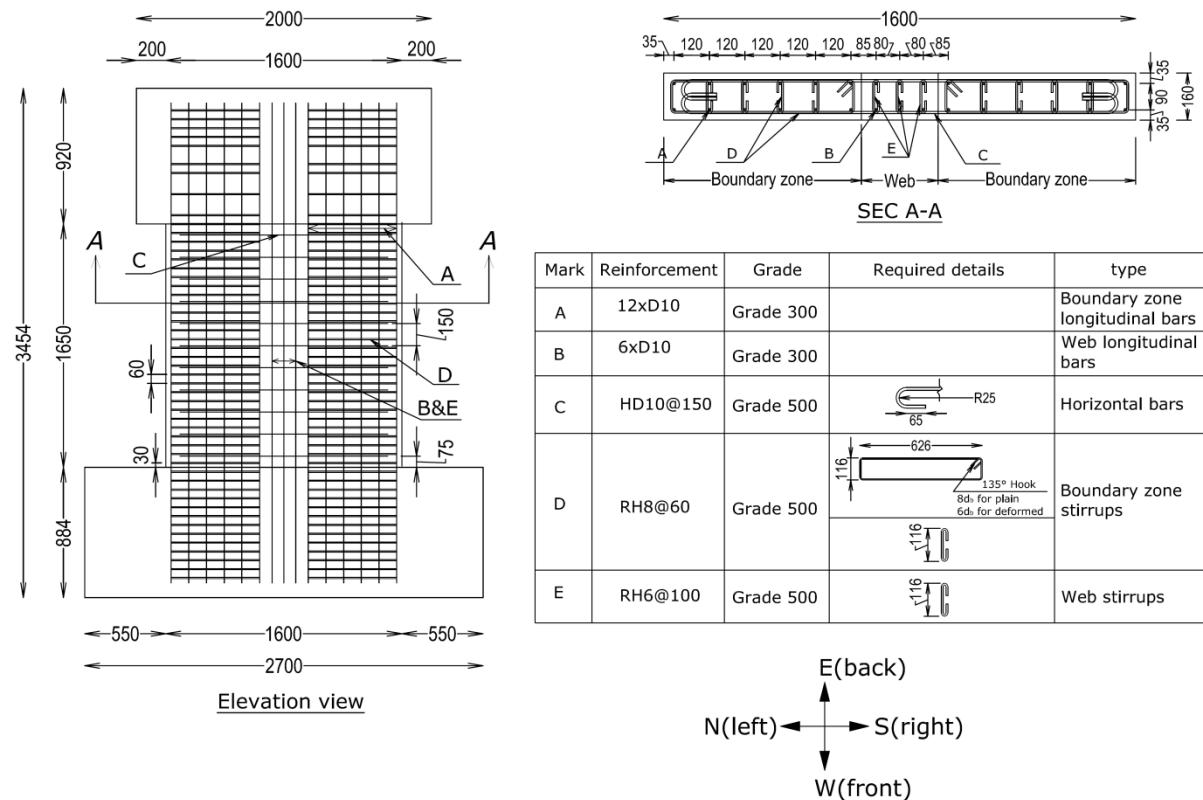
Details of the section and side view of the reinforcement layouts of the specimen SP4-D
